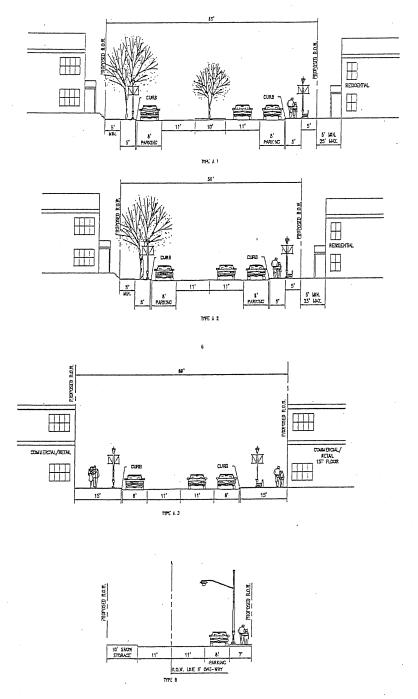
Some Proposed Typical Sections of Streets To Be Considered
